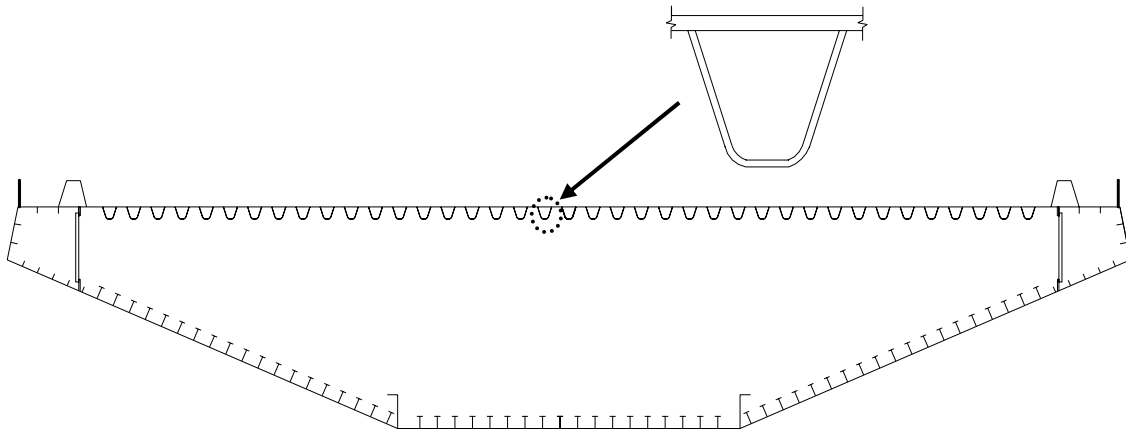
Typical Cross Section of Orthotropic Box Girder
